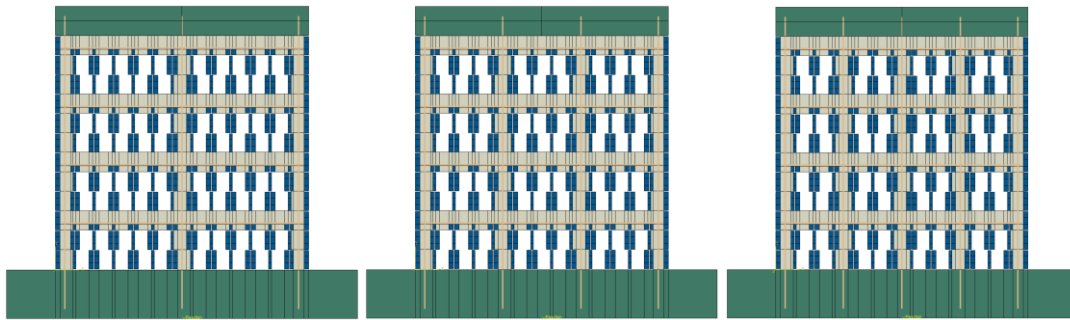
Grout Core Spacings (2.4 m Wall Height, 0.4 m Bond Beam Spacing)
